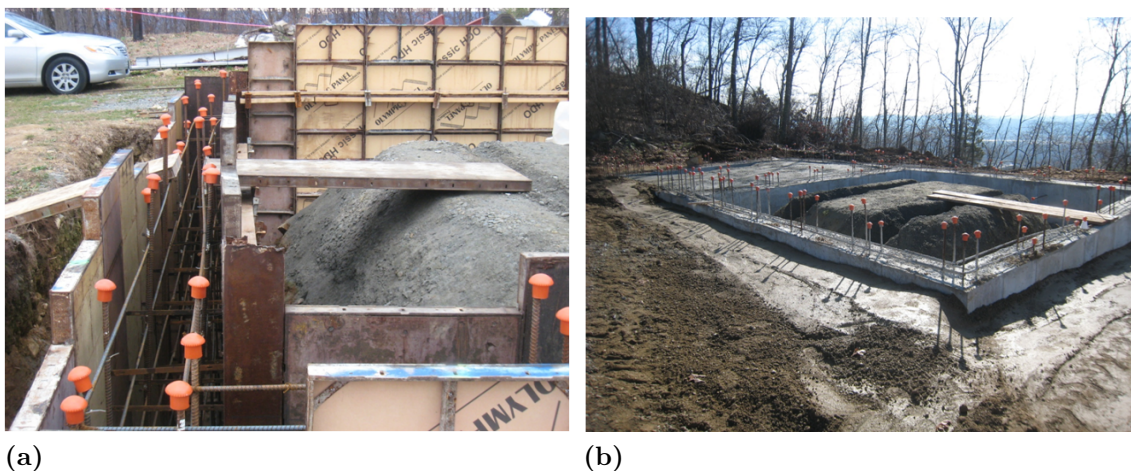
(a) Forms Built With Rebar Inside. (b) Concrete Foundation Before Slab Was Made. Photos Taken By Gil Jeffer.
